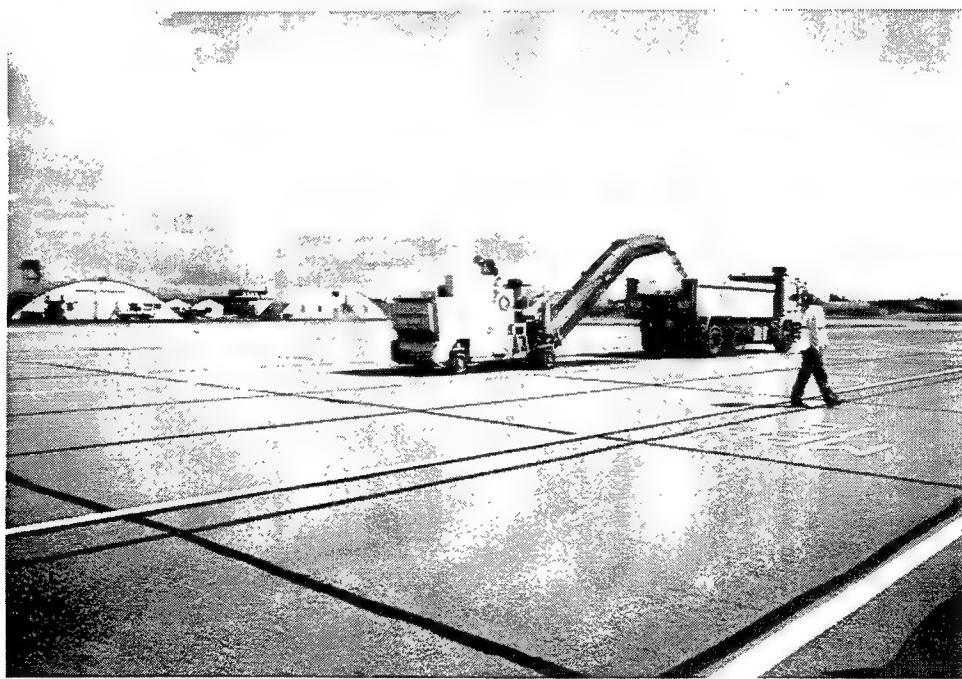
Cold milling of existing taxiway pavement in SMA demonstration project area (RAF Lakenheath)
